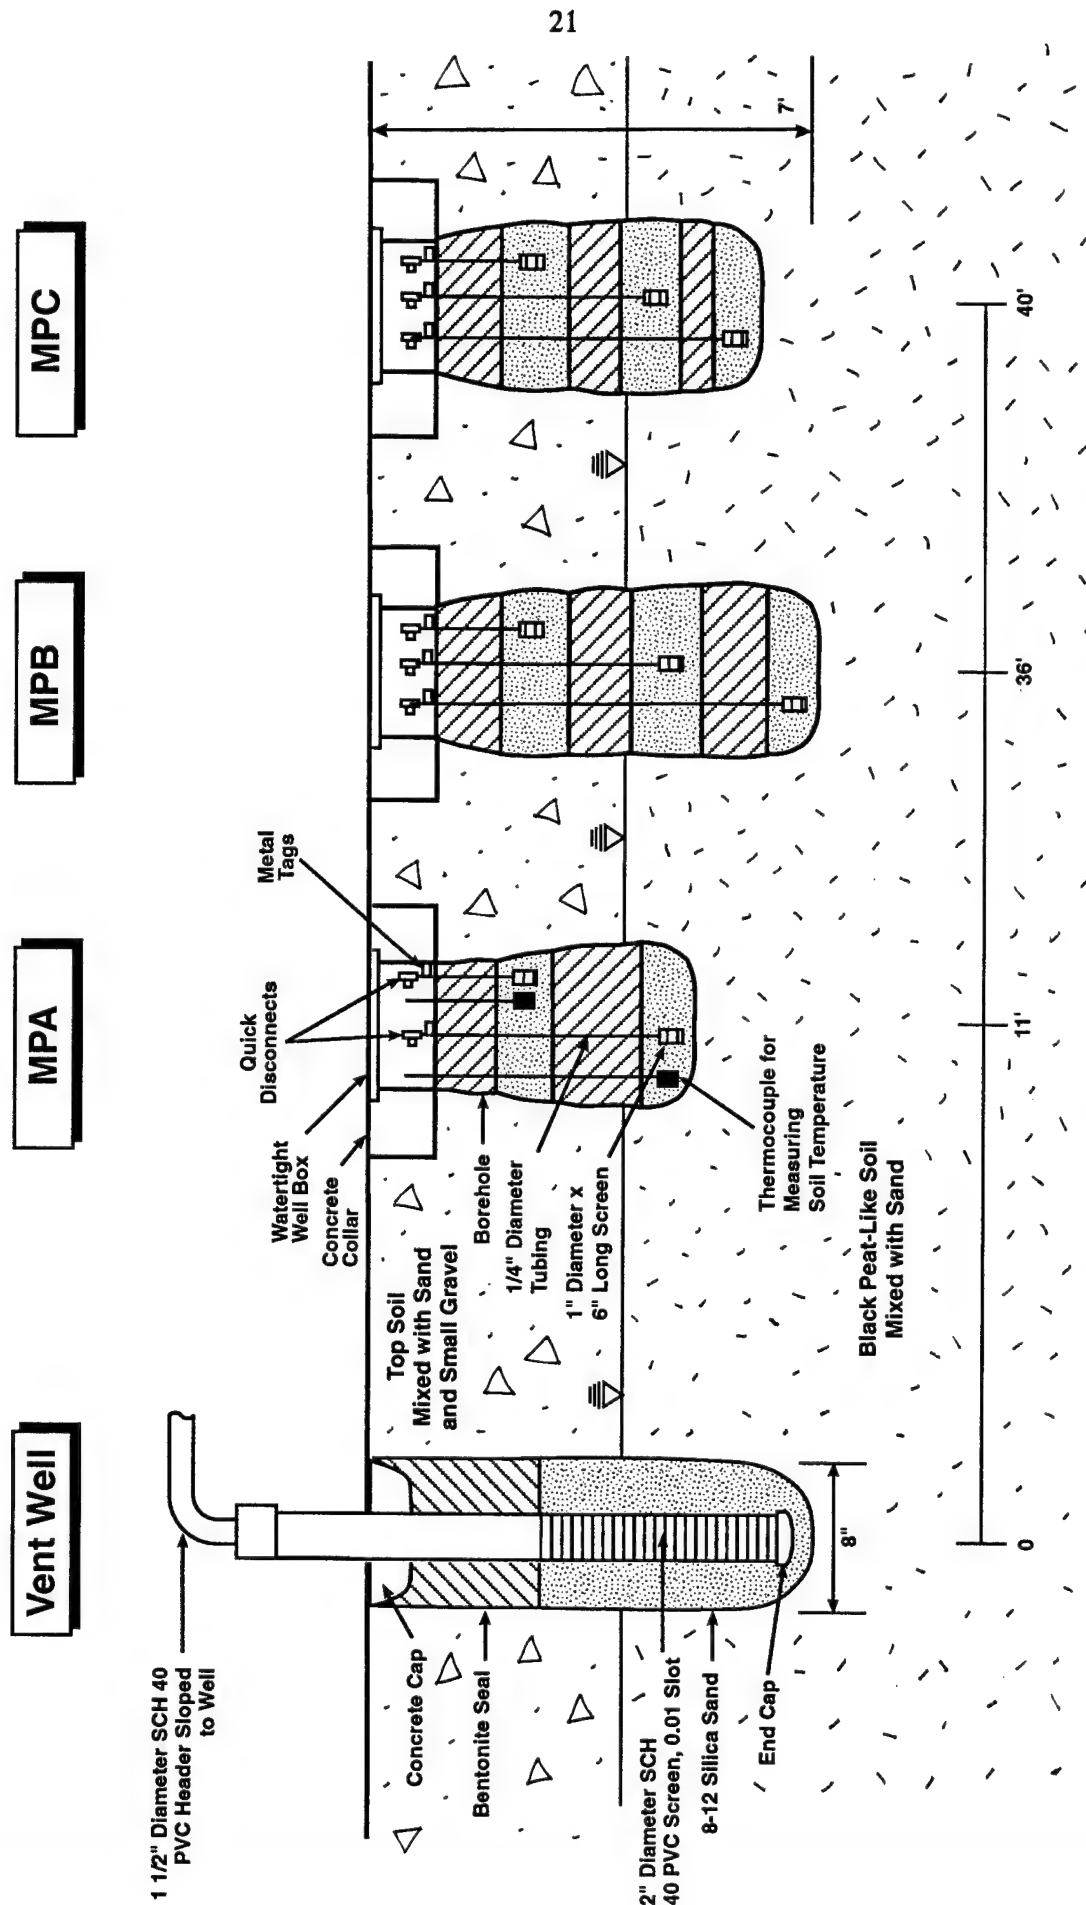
Cross Section of Vent Well and Monitoring Points at Building 1812 Showing Site Lithology and Construction Detail (not to scale)
